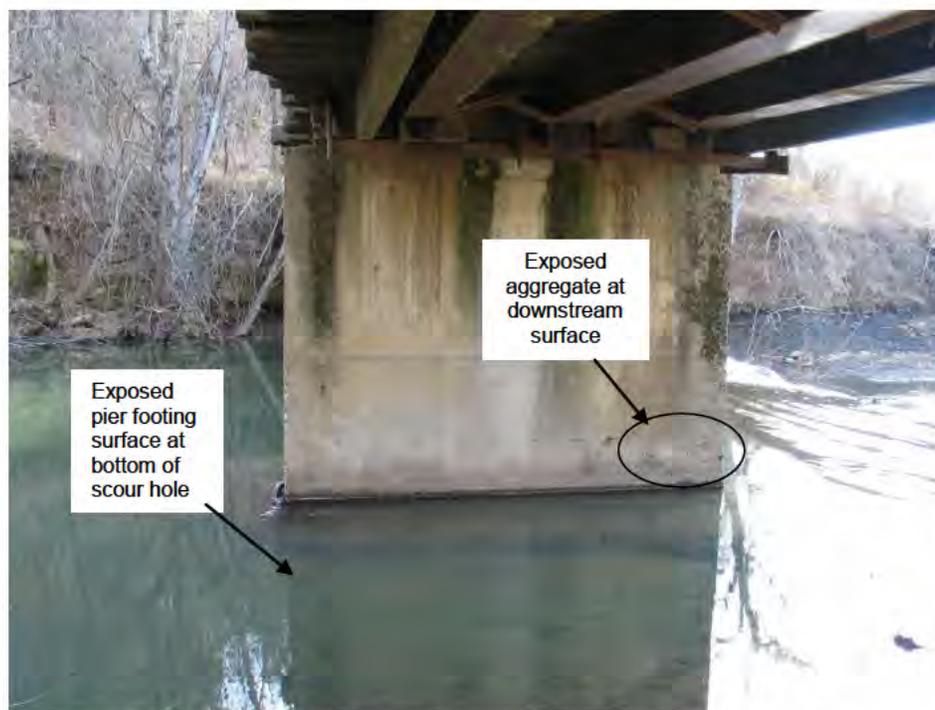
Millville Bridge Center Pier, 2012 (Source: NRO)
